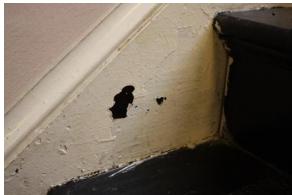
, Historic Courthouse, First Floor, Room 101, view of paint loss at stairway stringer.
